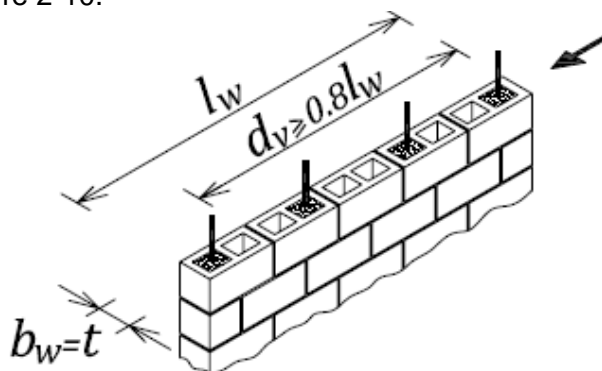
Wall cross-sectional dimensions used for in-plane shear design.
